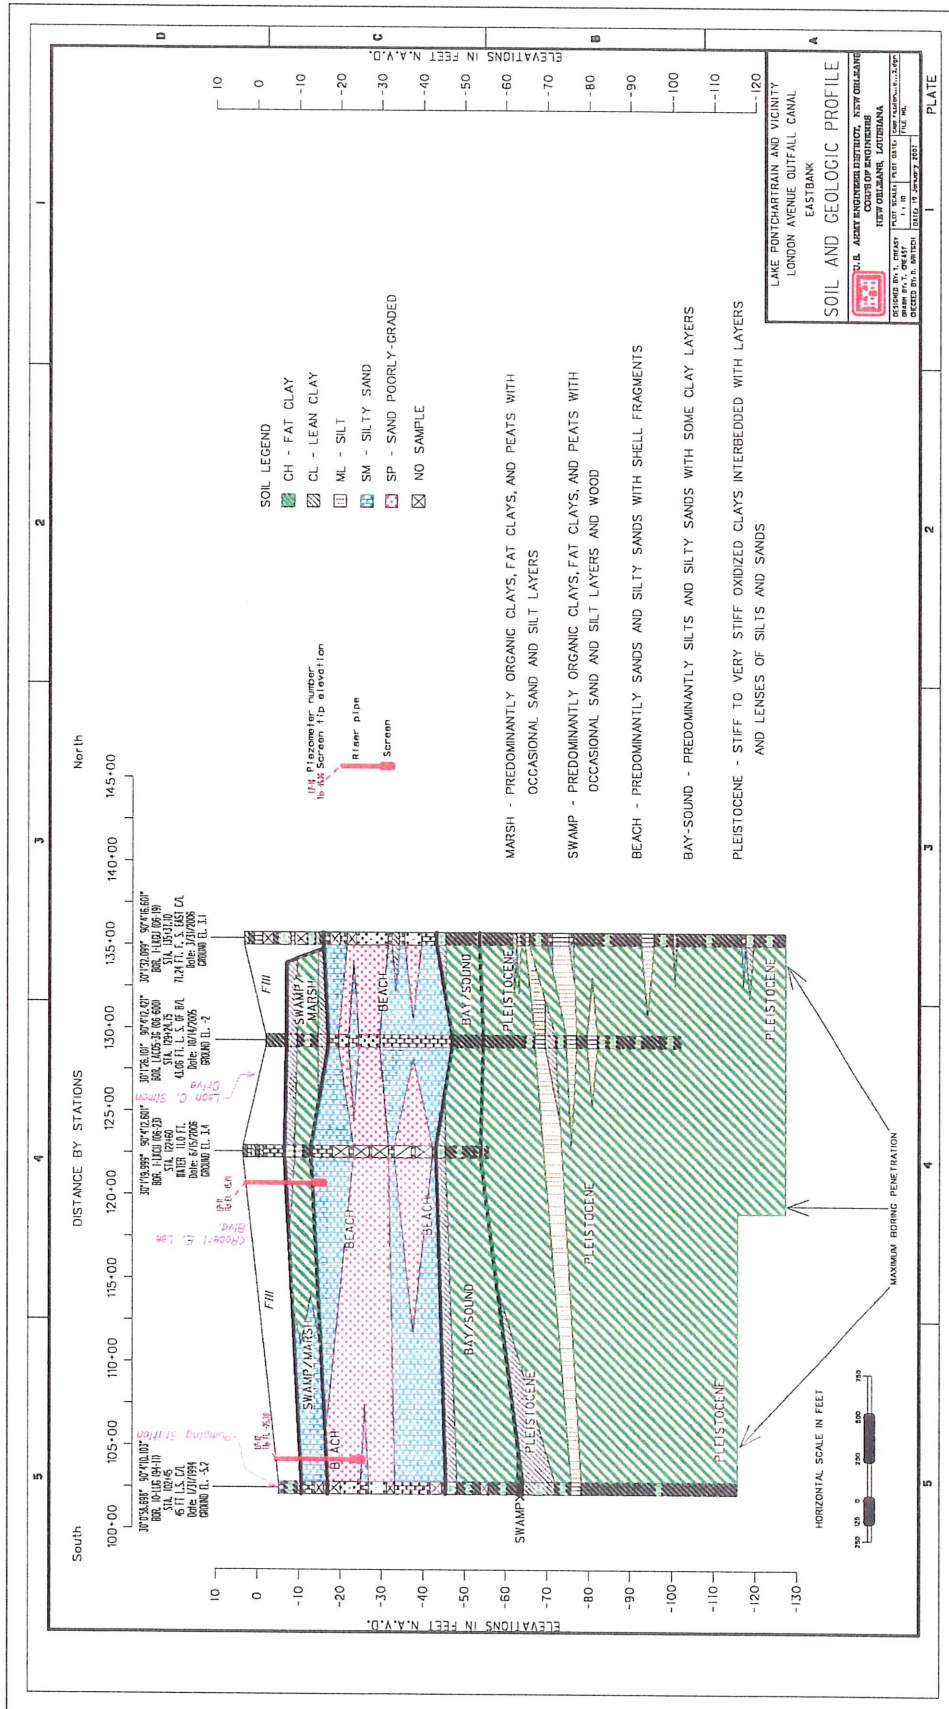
2007 Revised Stratigraphy East Bank of London Canal (Elevations in NAVD88)
